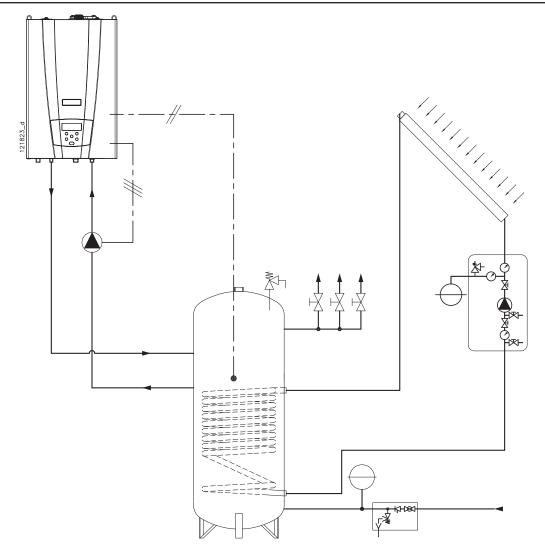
Example of system with solar panels and storage tank (Section 5.14)
